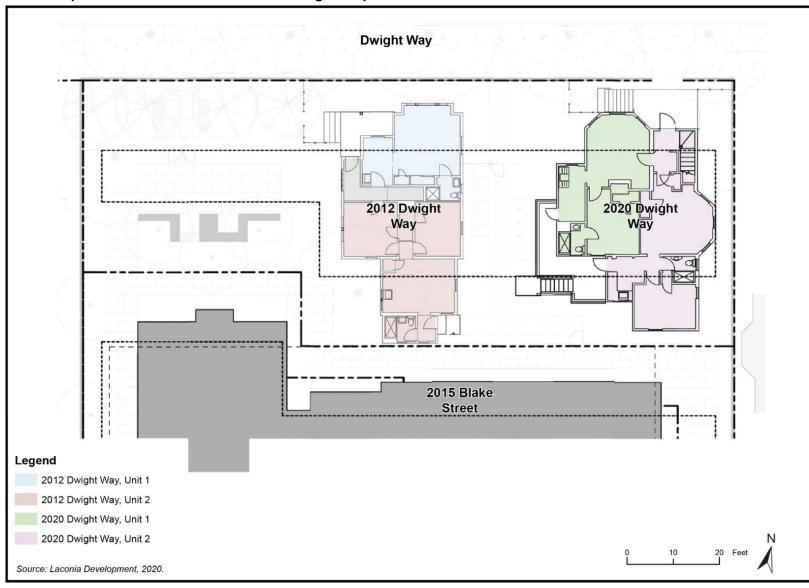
Proposed Site Plan – 2012 and 2020 Dwight Way
